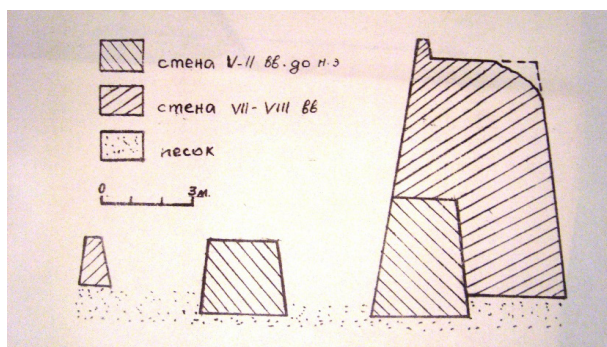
Schematic plan by M. Mambetullaev, reflecting the fortress wall construction stages
